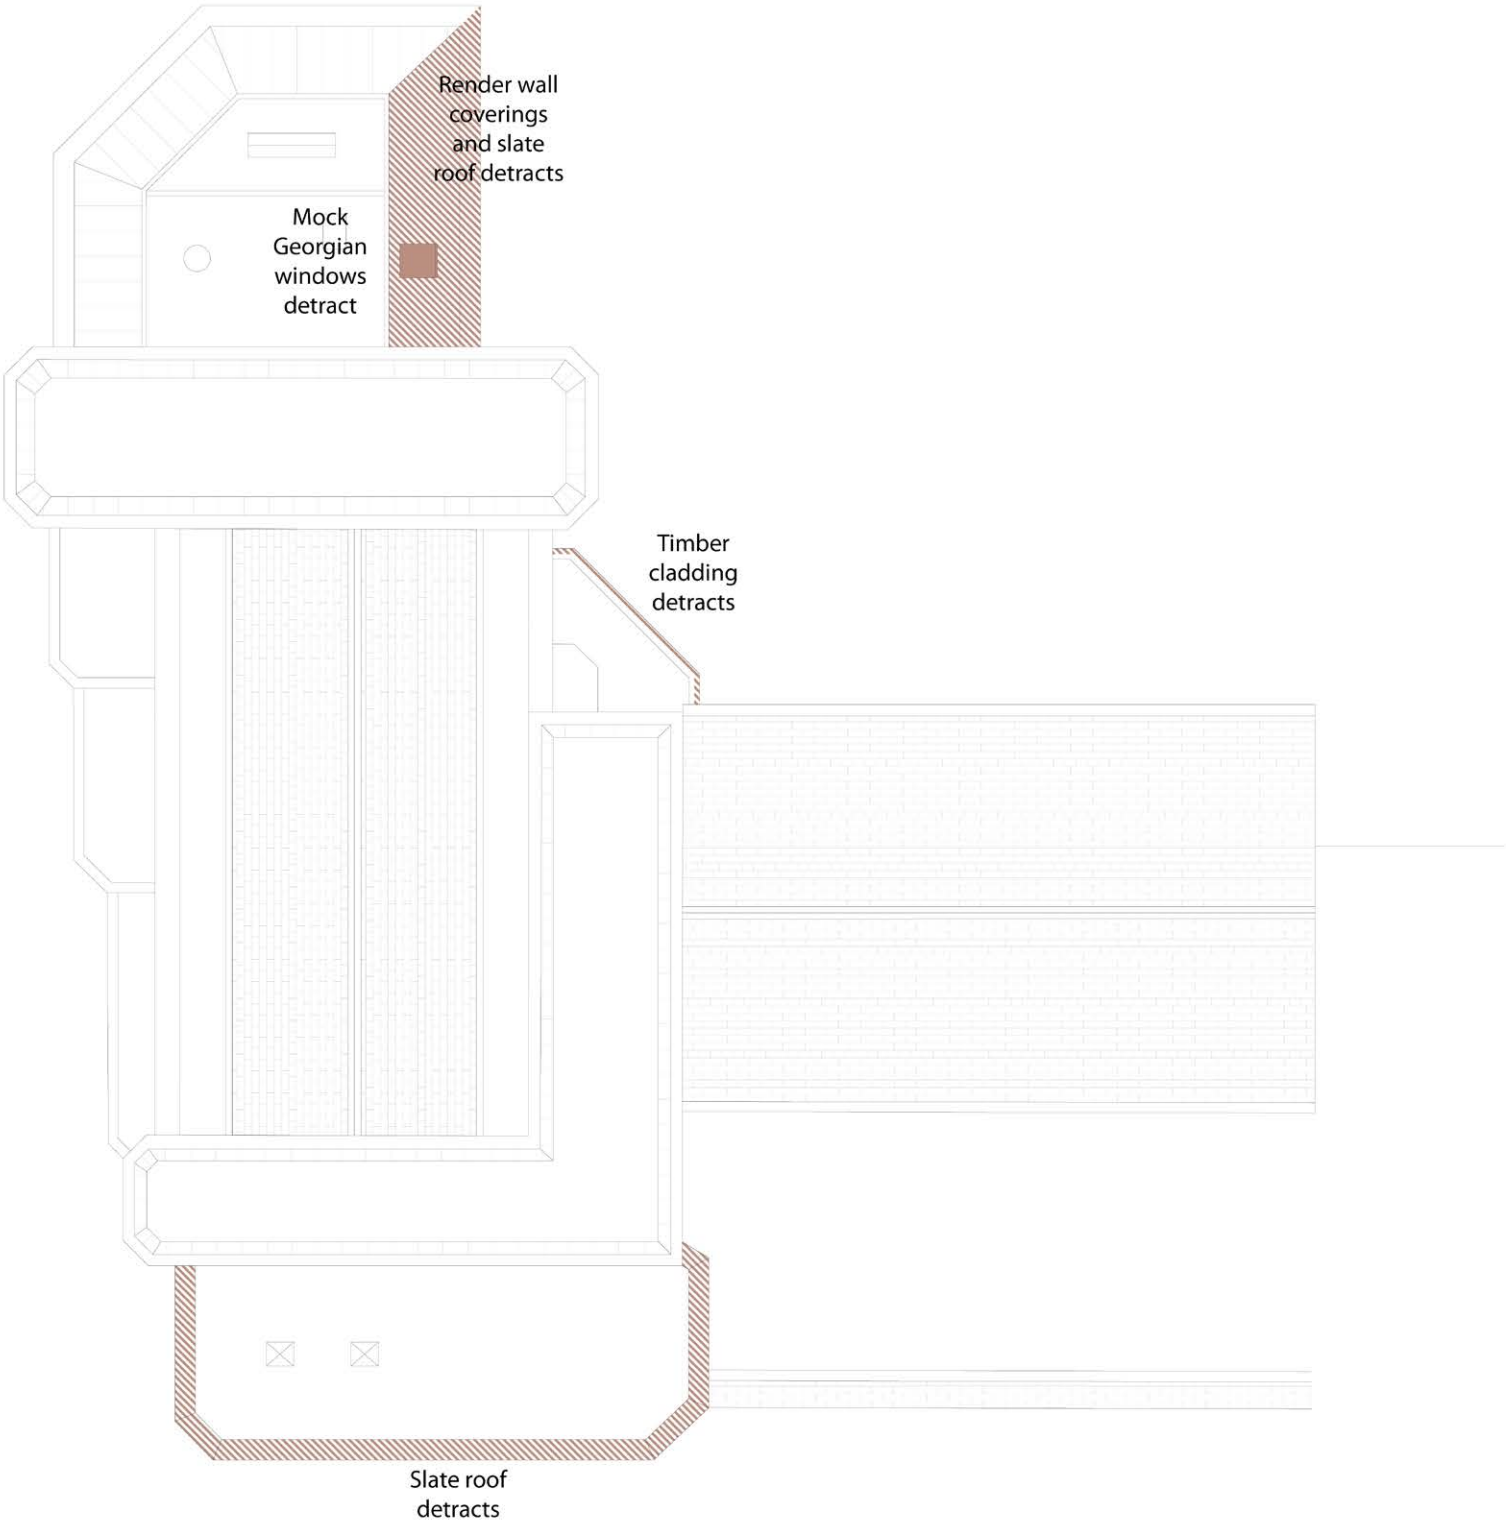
Roof detracting fabric [Ian Chalk Architects]
